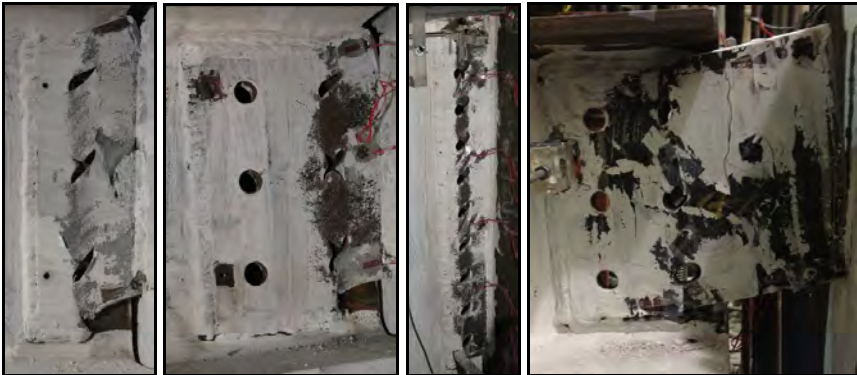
Photographs of post-test deformations for welded connections "Partial C" weld (Test Configurations 2,4,9 & 11)
